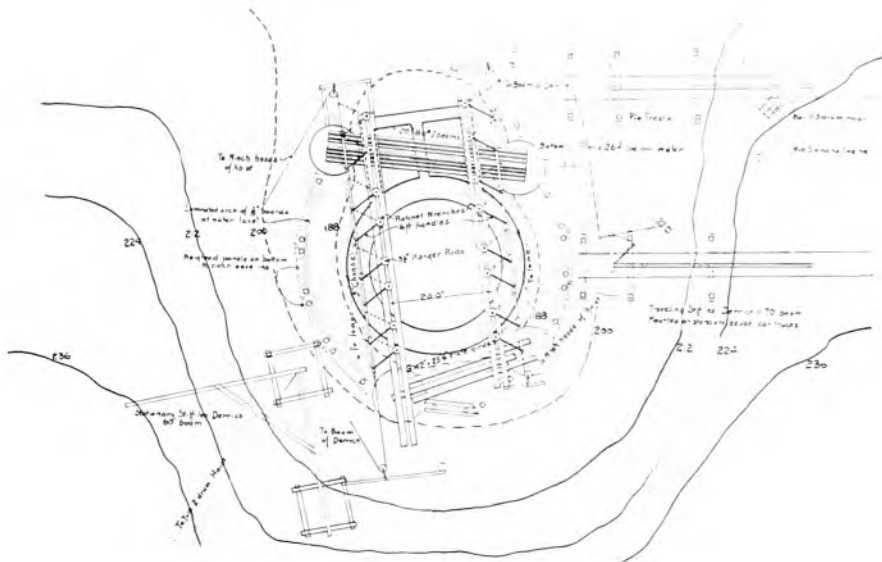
Diagram showing Equipment for Lowering House Derrick Locations and Excavations Contours
